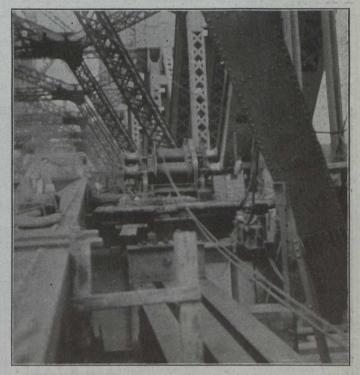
Electric Hoist on Cantilever Span Removes Lifting Links as Their Work is Completed
